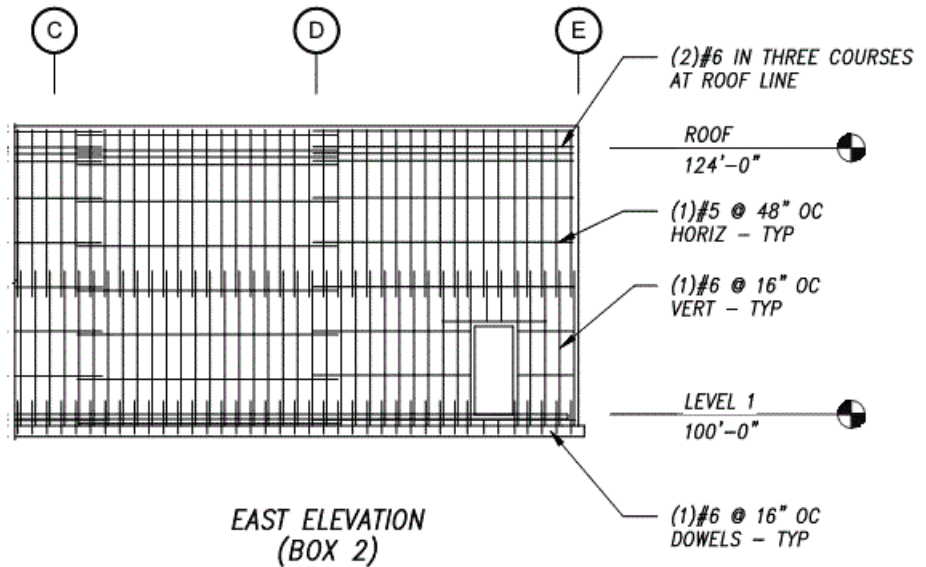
Single-story retail/industrial/warehouse building East elevation: BOX 2.
